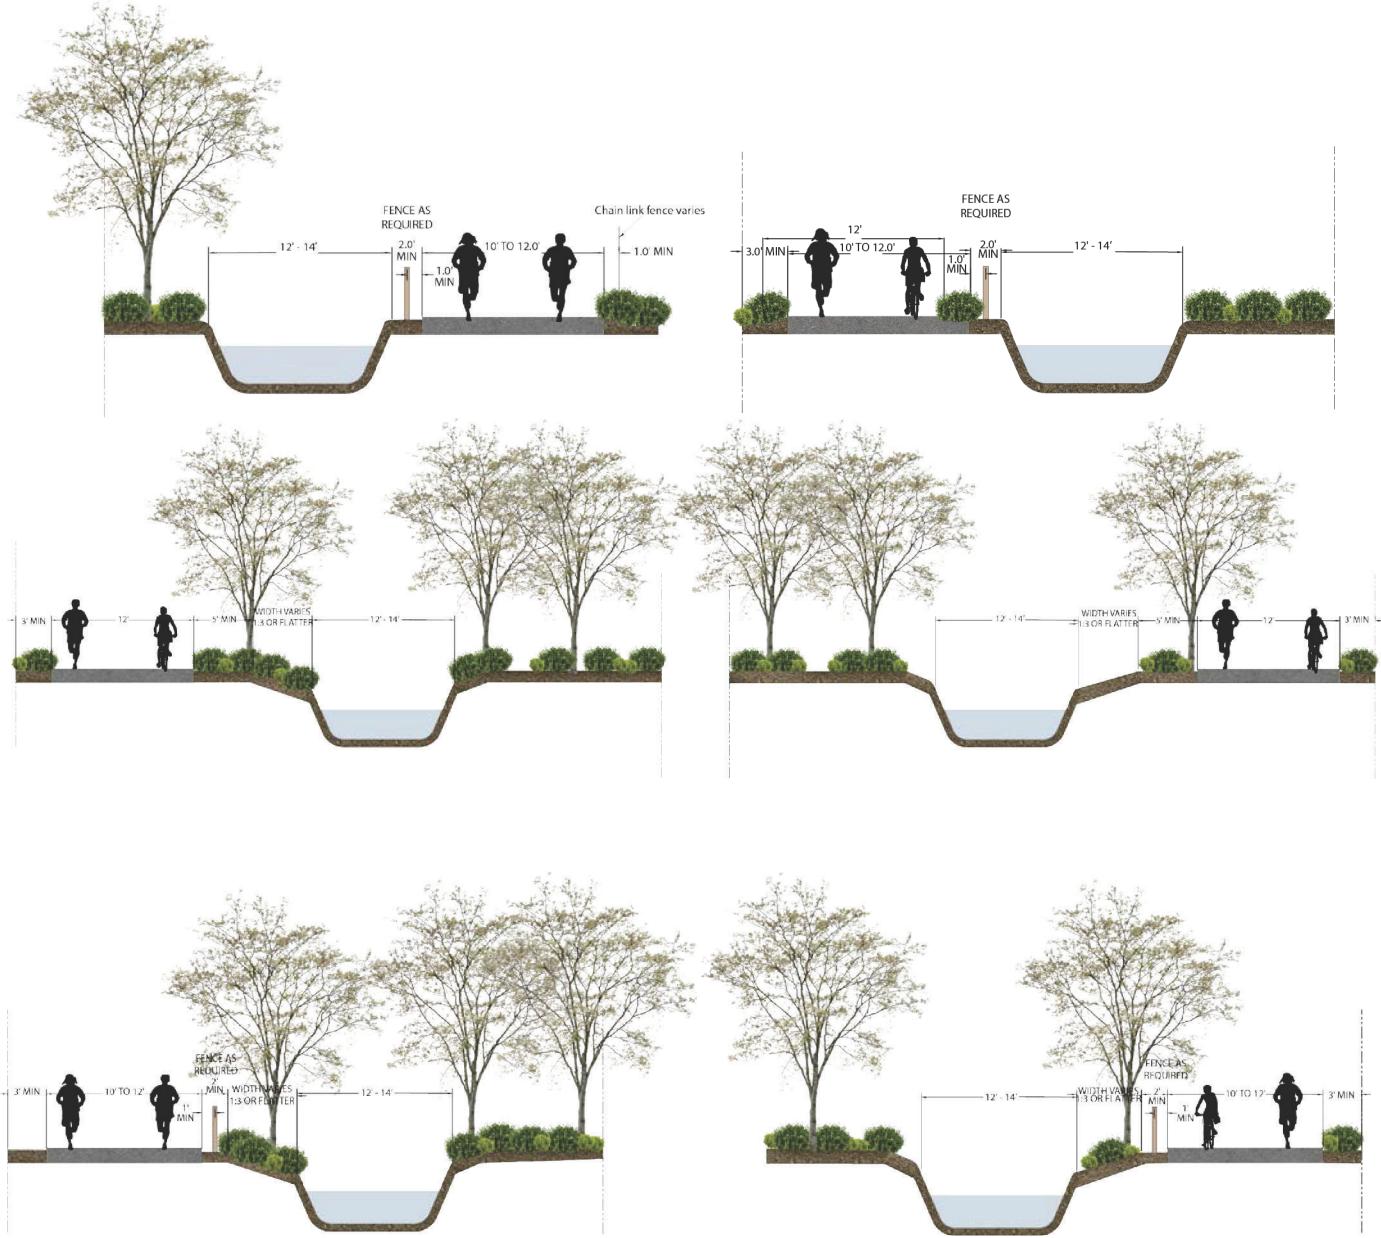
Jordan and Salt Lake City Canal Trail typical sections of trail on left or right side of canal.
